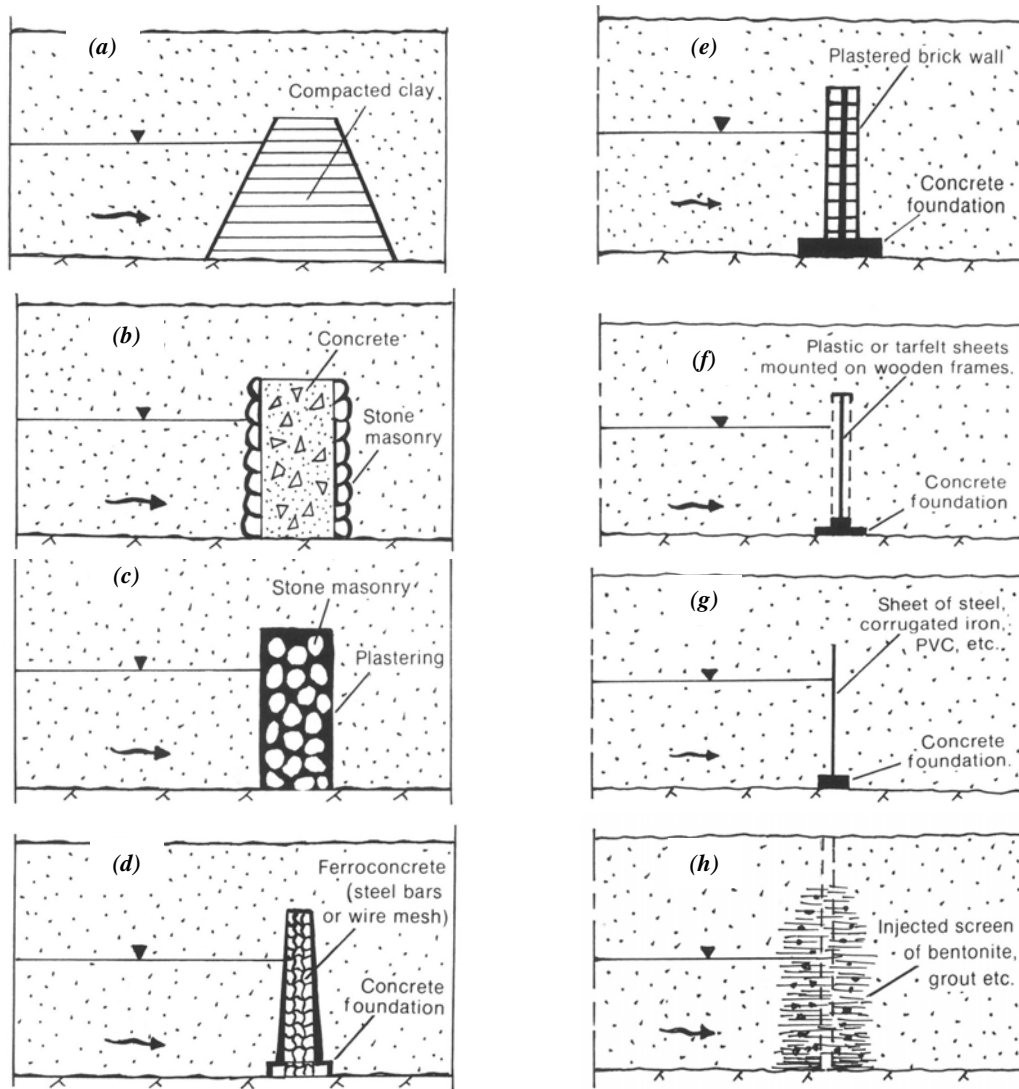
Sub-surface dam types: a) Clay dike, b) Concrete dam, c) Stone masonry dam, d) Reinforced concrete dam, e) Plastered brick wall, f) Plastic or tarred-felt sheets, g) Corrugated iron, steel, or PVC sheet, h) Injection screen (Hanson and Nilsson, 1986, Nilsson, 1988)
